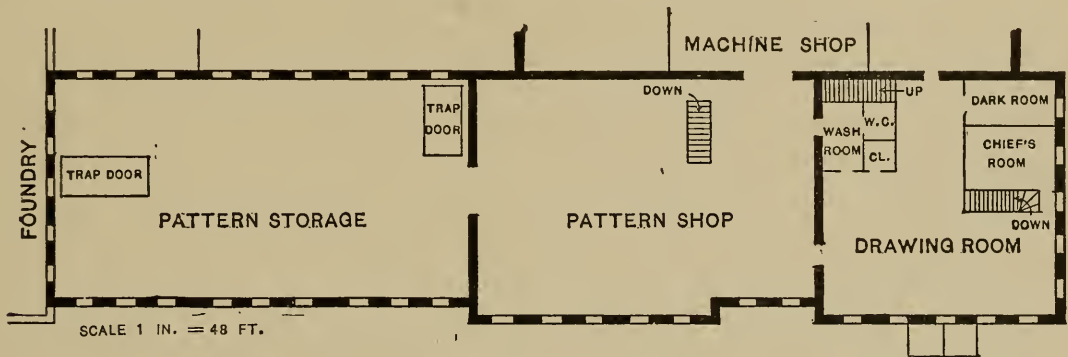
Plan of Second Floor of Front Building. Scale, one inch equals forty-four feet.
